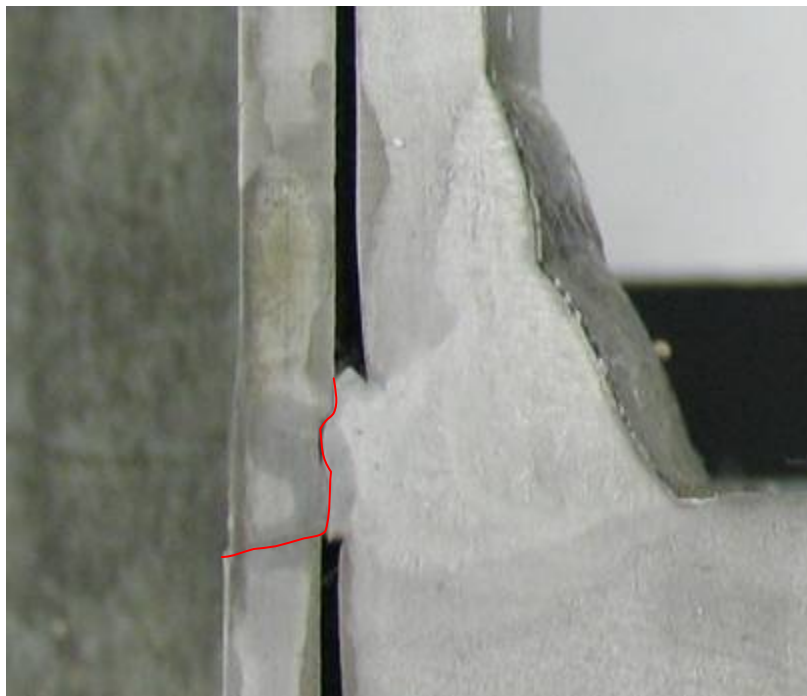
Fatigue Crack Through Pole Wall
